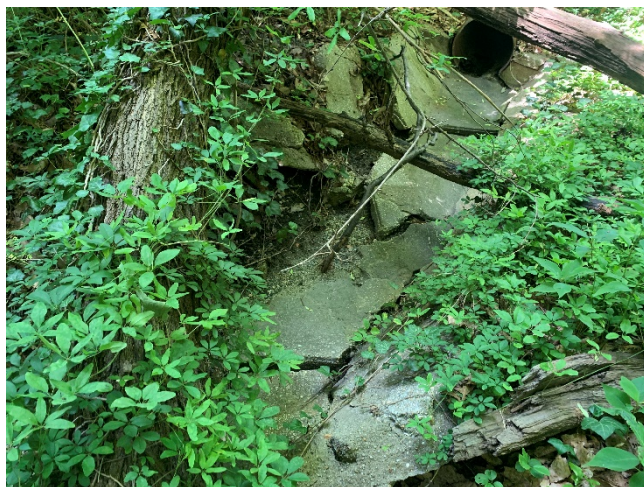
Structure #60: Concrete outfall channel cracked and failing
